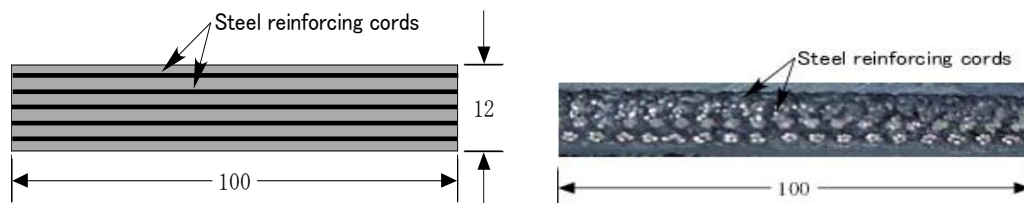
Cross section of a single layer STRP: sketch and photograph.
